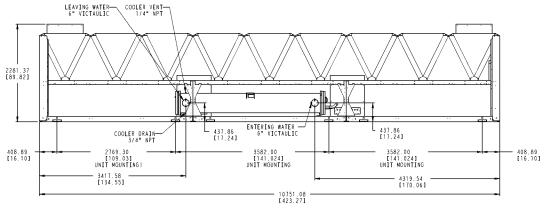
30RB275 Air-Cooled Chiller Dimensions
